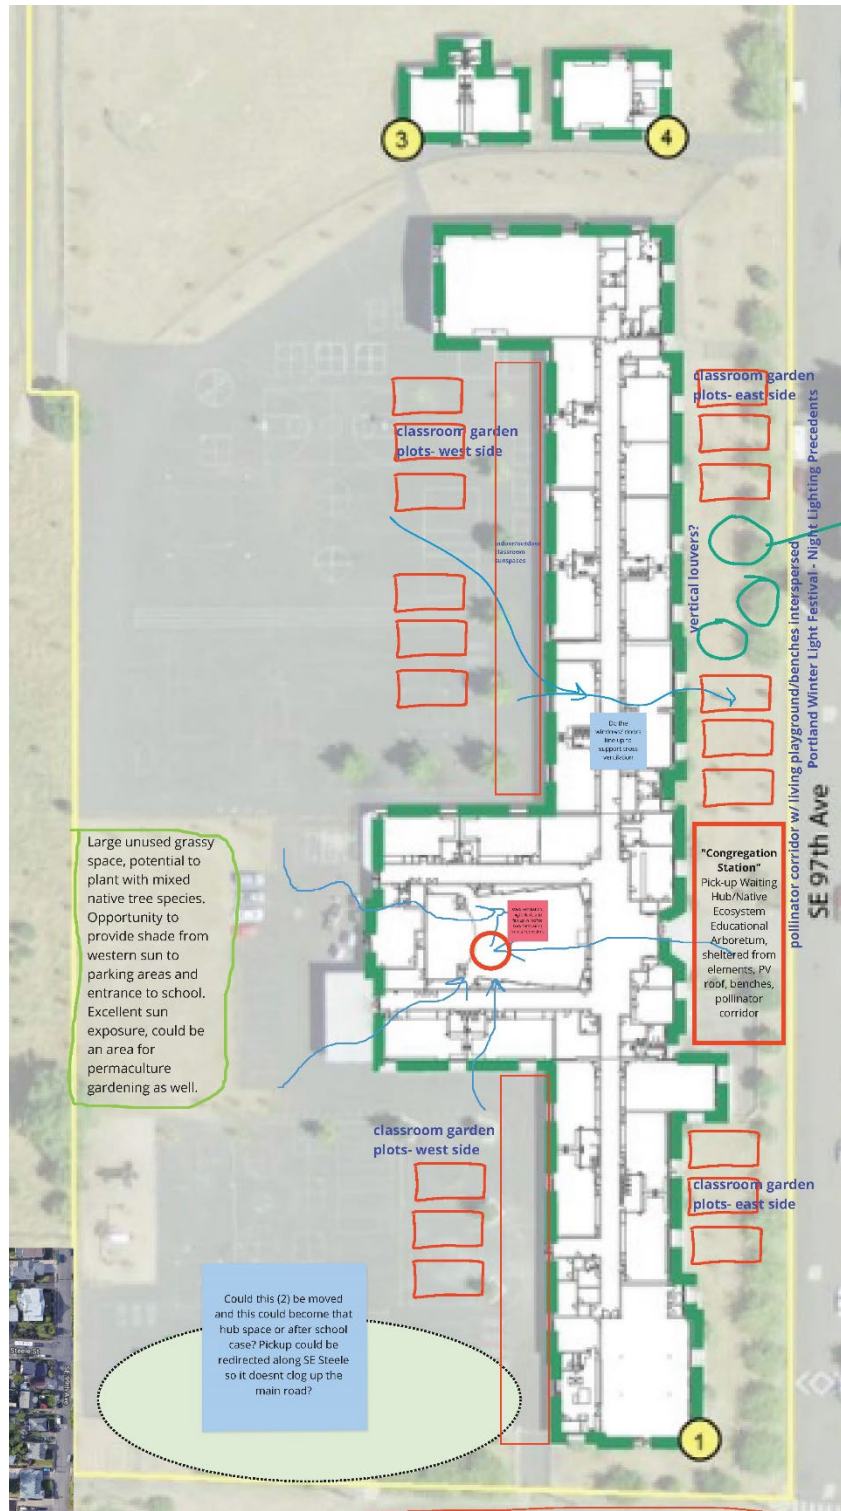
Composite plan, illustrating the congregation pavilion on the east side, accompanied by classroom garden plots and native plantings, as well as transitional indoor-outdoor spaces on the west side to provide covered outdoor space, shade, and protection from noise and pollution from I-205.
